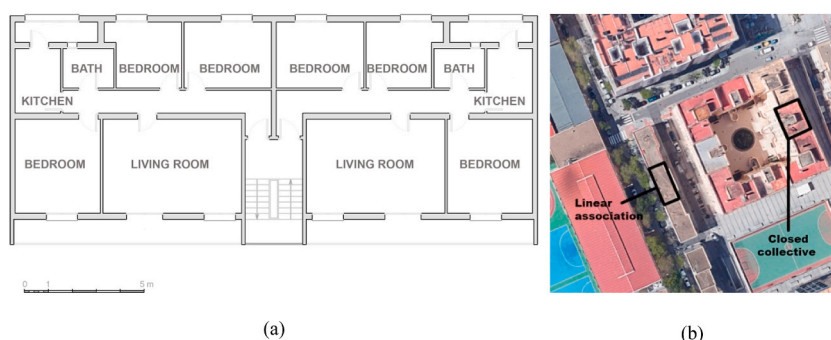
Example of the analysed stock: floor plan (a) and urban typologies (b).
